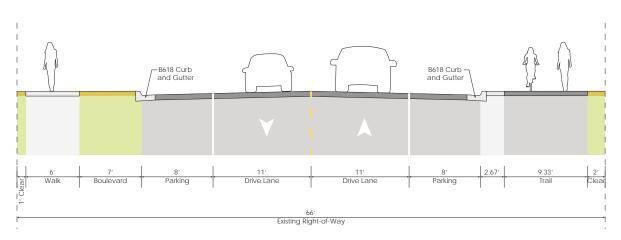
Bald Eagle Avenue, Highway 96 to White Bear Lake High School Proposed Section.
